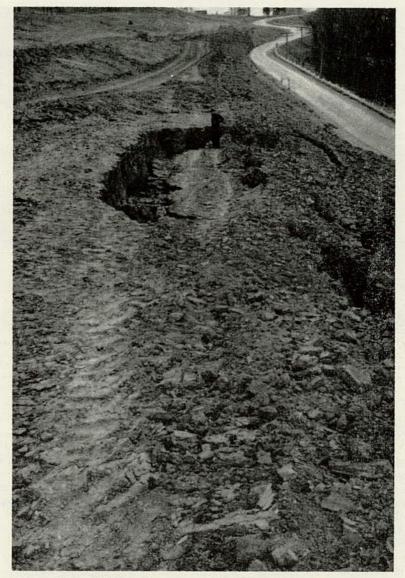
Landslide in newly constructed sidehill fill, U. S. Route 40, Gurnsey County, Ohio. This slide was eliminated by total excavation of the moving fill and underlying soil down to a level bench in the bedrock. After obtaining a stable foundation on bedrock and providing a drainage course up the excavated backslope, the fill was reconstructed and has shown no further movement. (Photograph courtesy of Ohio Department of Highways)
